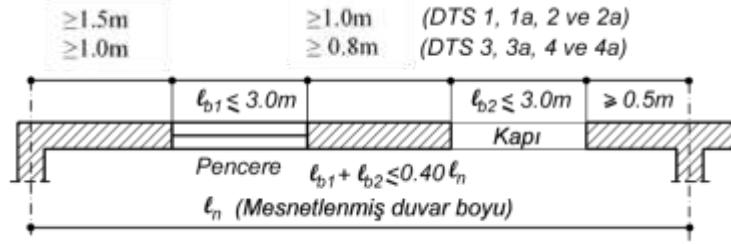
Turkish Building Earthquake Codes approach distances in masonry walls
